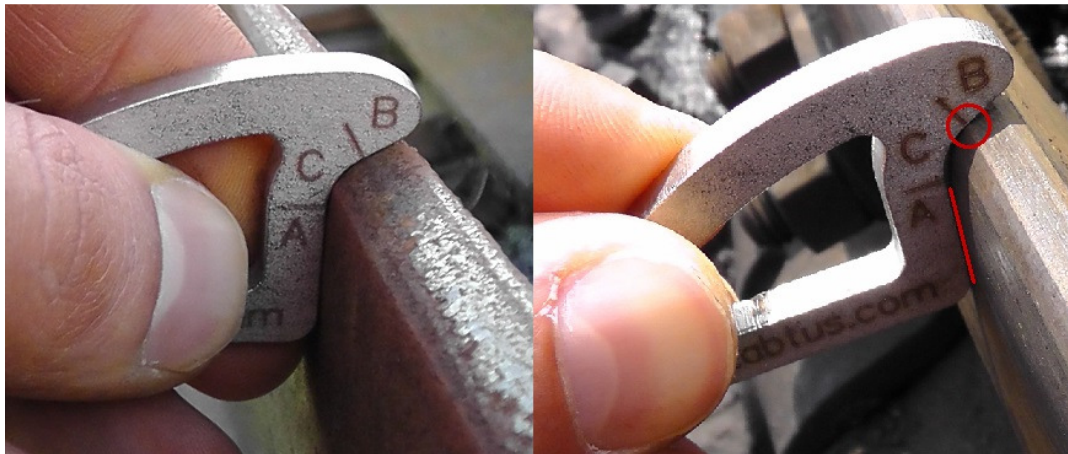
Example of how rocking of switch rail radius gauge may lead to different inspection results (left: pass example; right: fail example)
